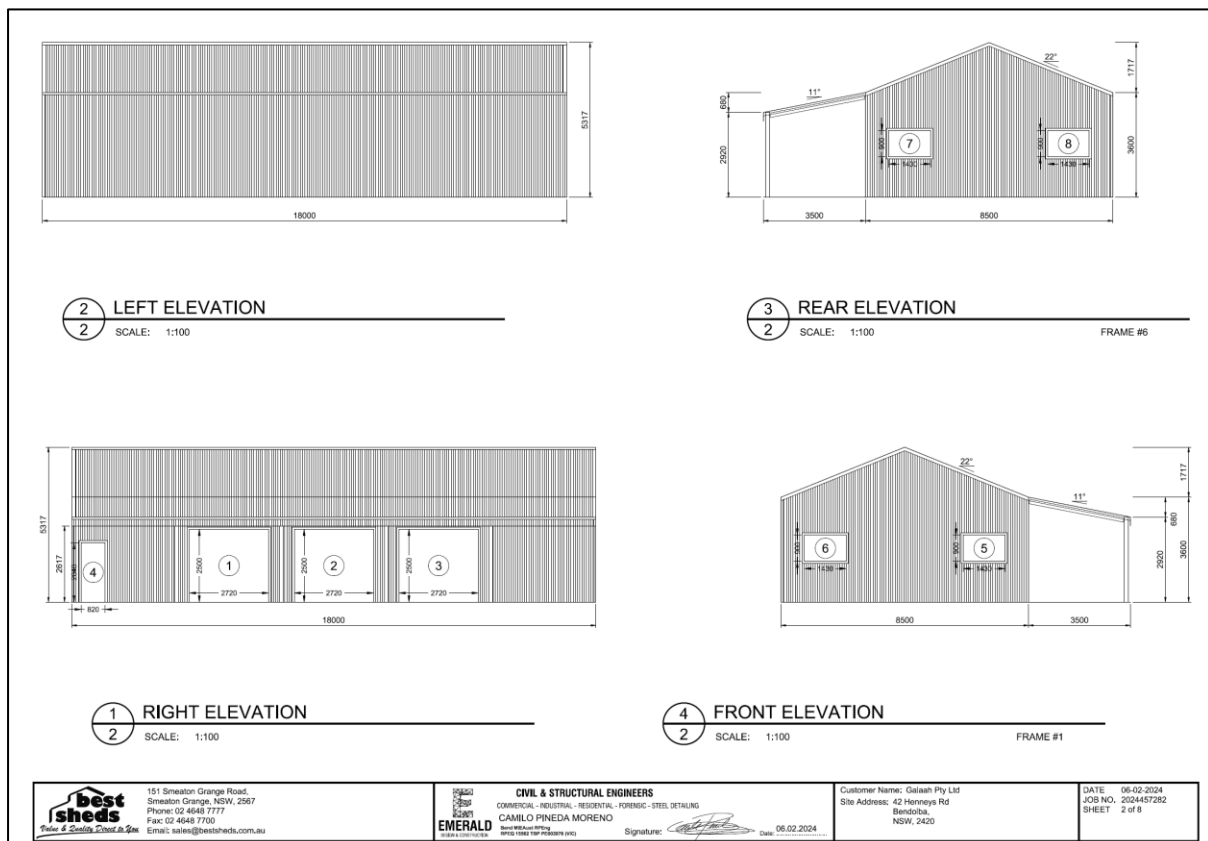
Farm Building Plans (Source: Best Sheds, 2024)
